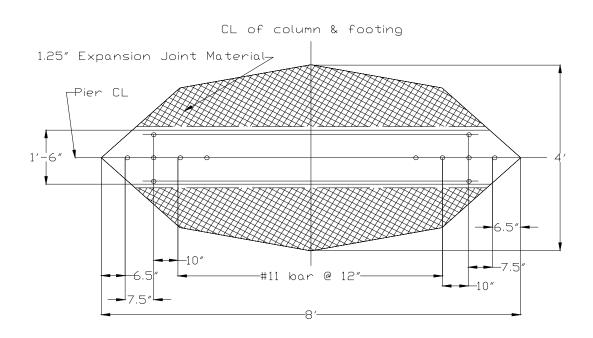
Detail of hinges on top of the footings of 1RWD off-ramp
